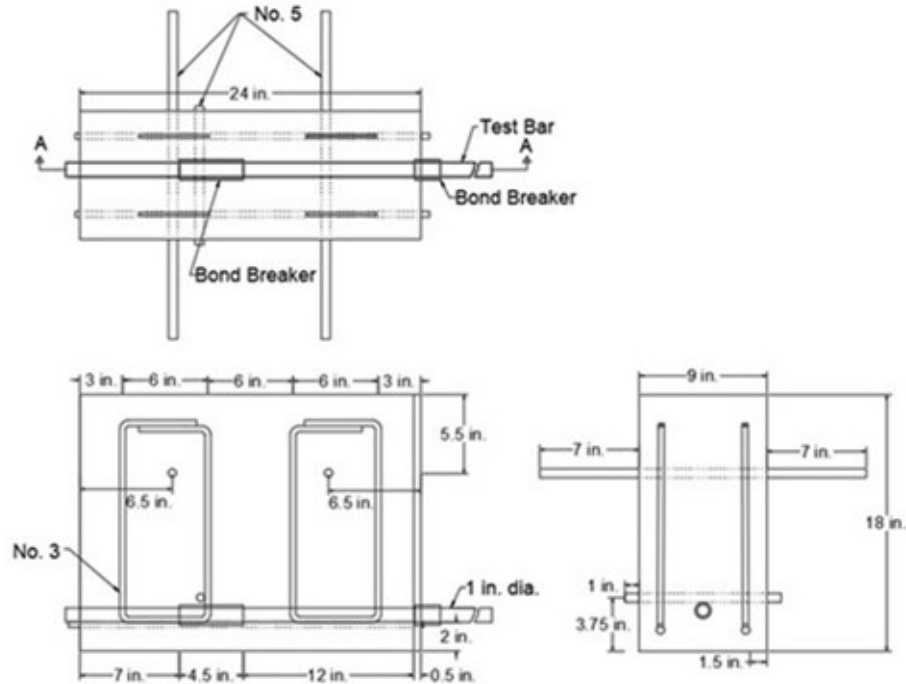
Details of the beam-end specimen without confining reinforcement (figure after Darwin and Graham 1993)
